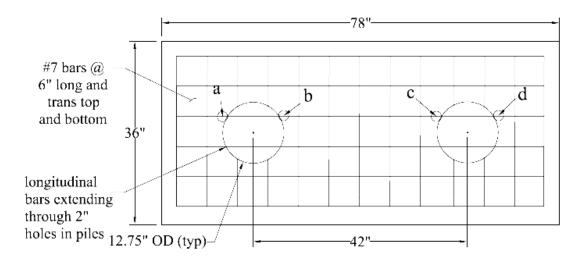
Pile Cap plan view dimensions (typical all caps).
